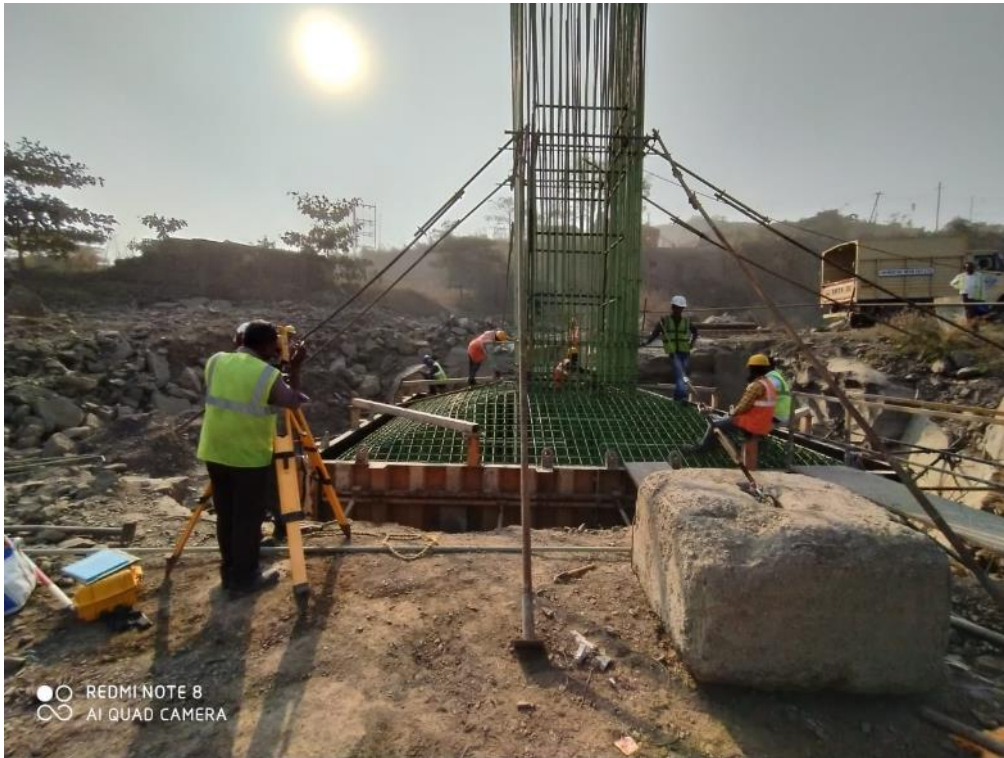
Foundation co-ordinates checking at Jasai area is in progress
